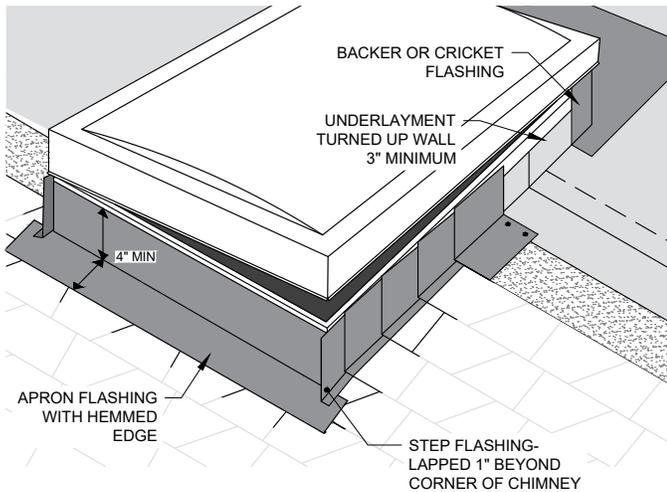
Installation of Self-Adhering Underlayment and Metal Flashings at Roof Openings
